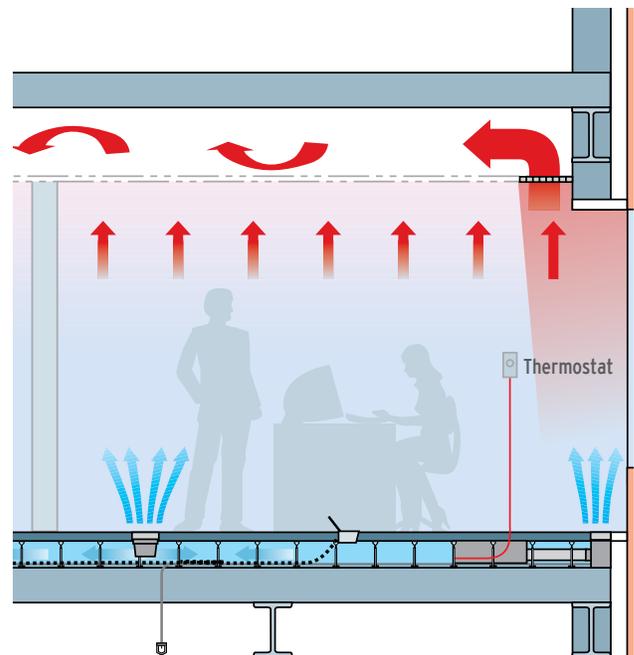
New location of larger return grille and thermostat that reduces the perimeter zone size to the original design.
